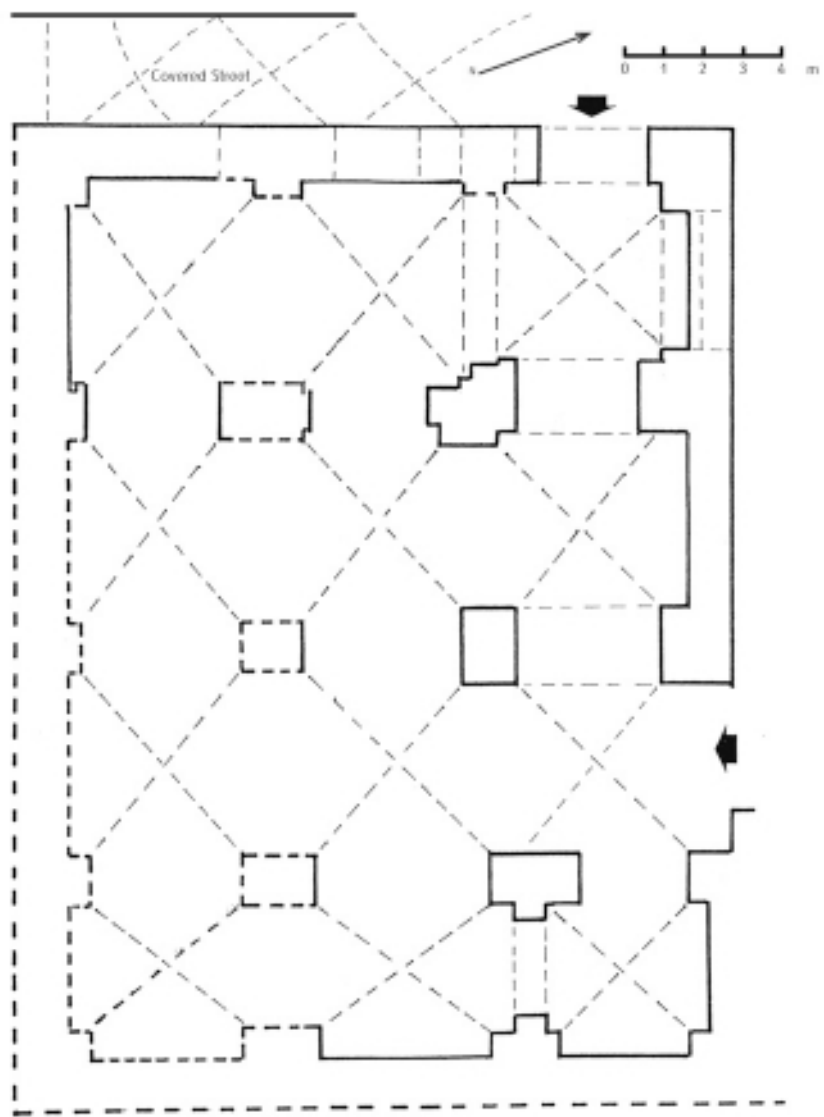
Plan of palace in Acre (House 1:5) (drawing by author).
